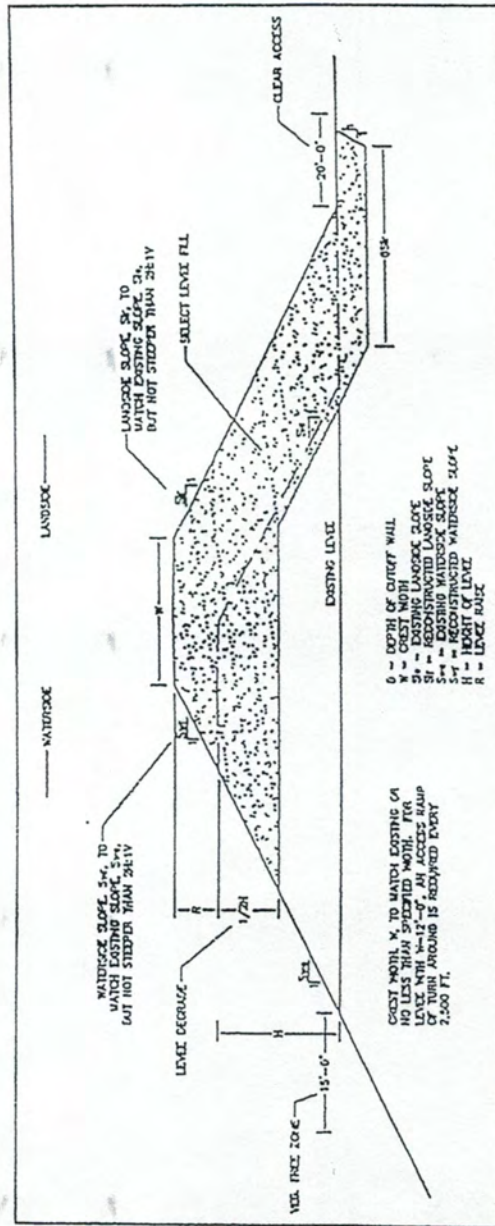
Levee Reshaping and Levee Raise Typical Plan. Note that the landside easement (right side) shown would be the maximum clear access easement; landside easements would range from 10 feet to 20 feet from the levee toe. Half levee degradation is generally not proposed unless a cutoff wall would be installed. Instead, an internal drain may be constructed between the existing levee materials and the new fill.
